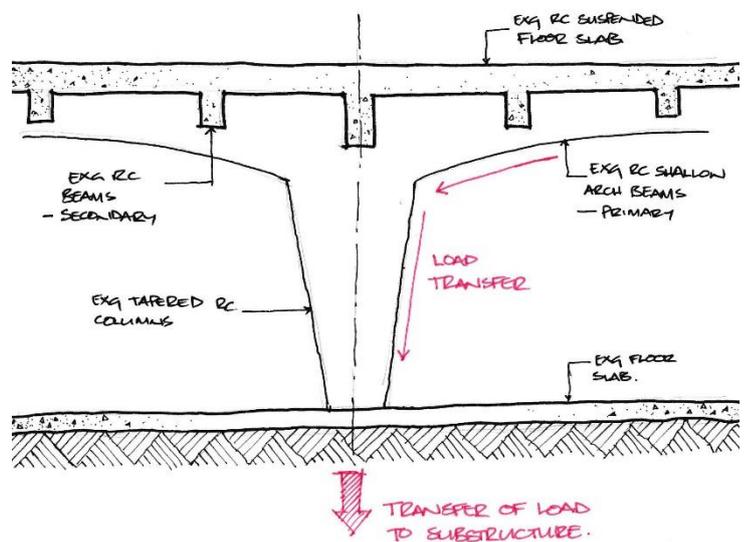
(Left): Existing structural columns, beams and slab. Figure 78 (Above): Sketch section of the existing structural system. (Source: Author)
